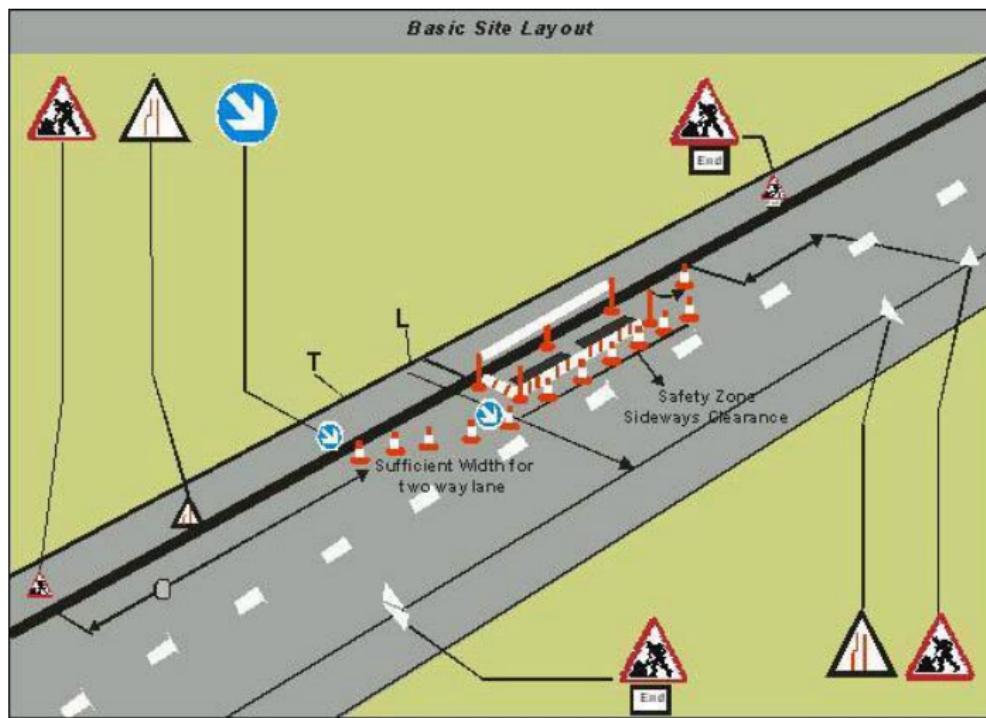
Basic Layout for Signs at a Road Works Site, Including Work Space and a Safety Zone.
